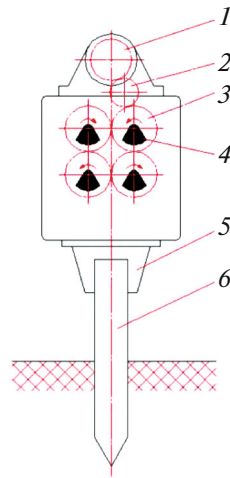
Vibrating submerger. Structural diagram of the vibrator: 1—electric motor or hydraulic motor; 2—intermediate gear; 3—synchronizing gears; 4—eccentrics; 5—headgear; 6—pile.
